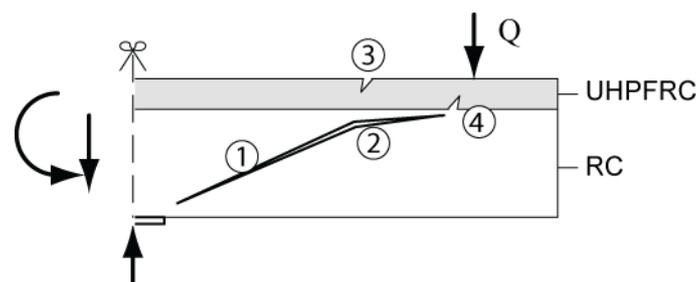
Flexural-shear collapse mechanism: typical crack pattern and formation of hinges
